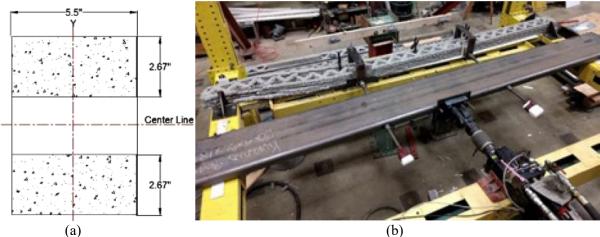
(a) Cross section of typical truss beams and (b) Aerial view of 3D-printed RC beams tested by Al-Chaar et al. [8].
